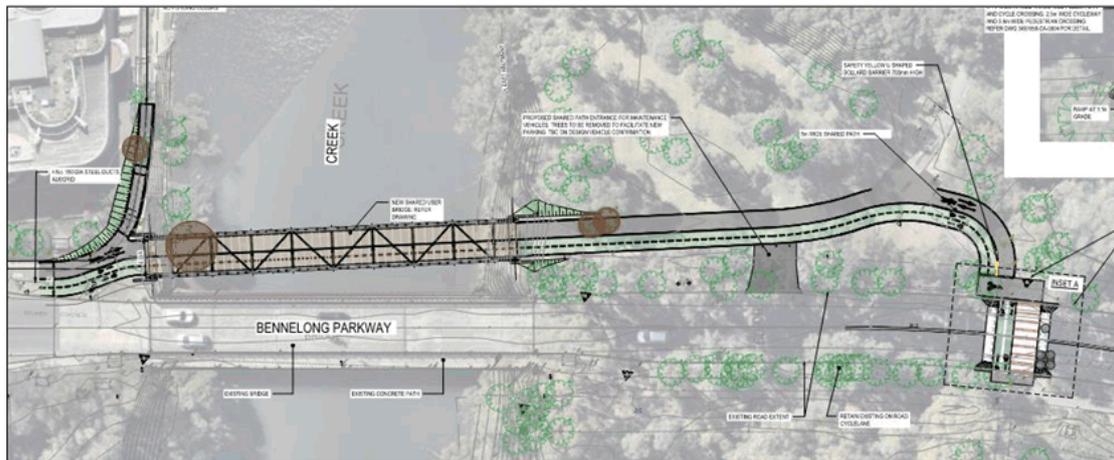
Proposed development (Source: Sturt Noble, 2023)
